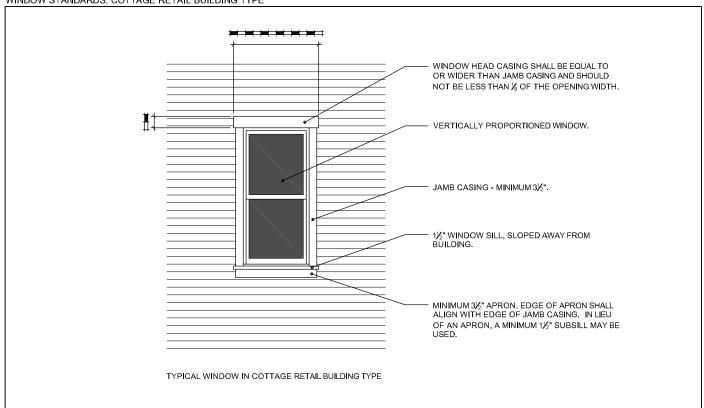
COTTAGE RETAIL TYPE WINDOWS
